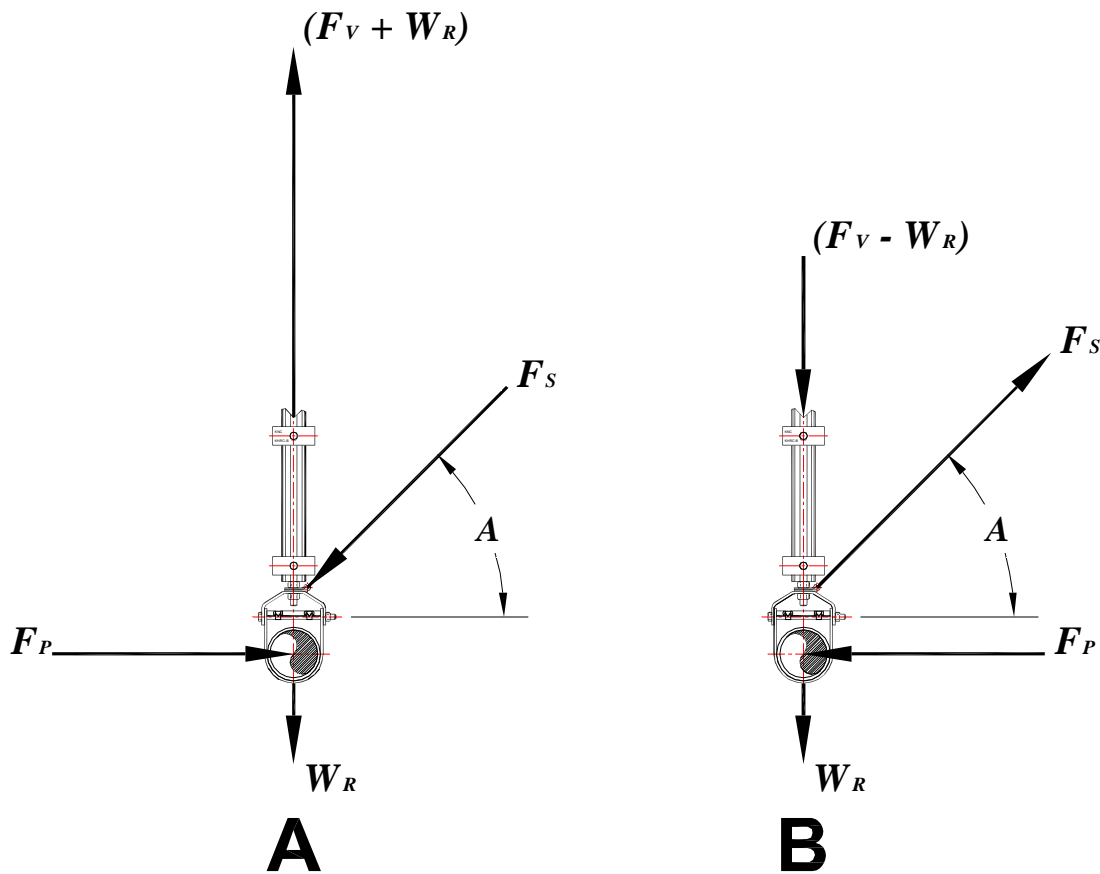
; Forces Acting on a Strut Restrained Single Hanger Rod Supported Pipe or Duct
